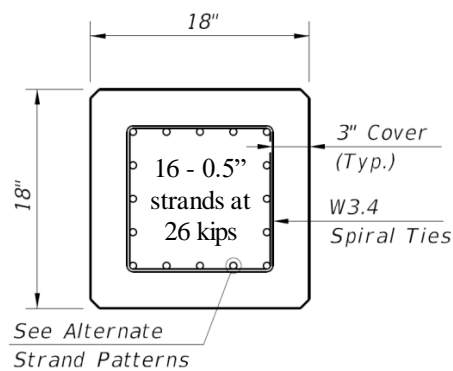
Details for 18-inch square prestressed concrete pile used in Bridge #3 [53]
